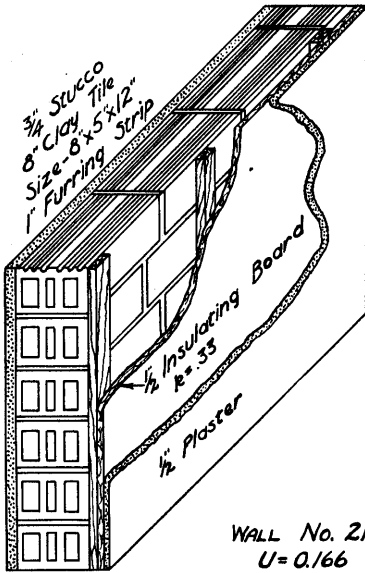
SECTIONAL VIEWS OF TEST WALLS
